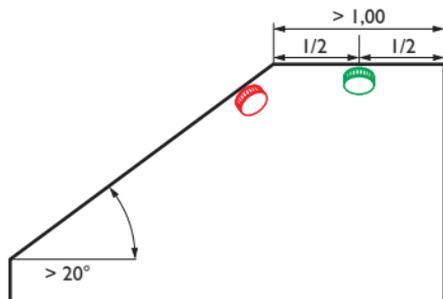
Straight mounting surface at least 1 m long and 1 m wide
